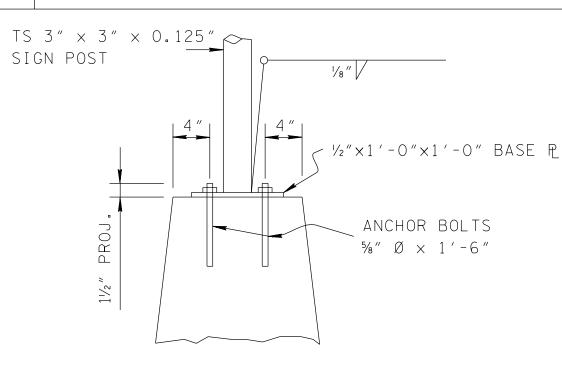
## DETAILS FOR SIGNS MOUNTED ON CONCRETE MEDIAN BARRIER & RETAINING WALL
